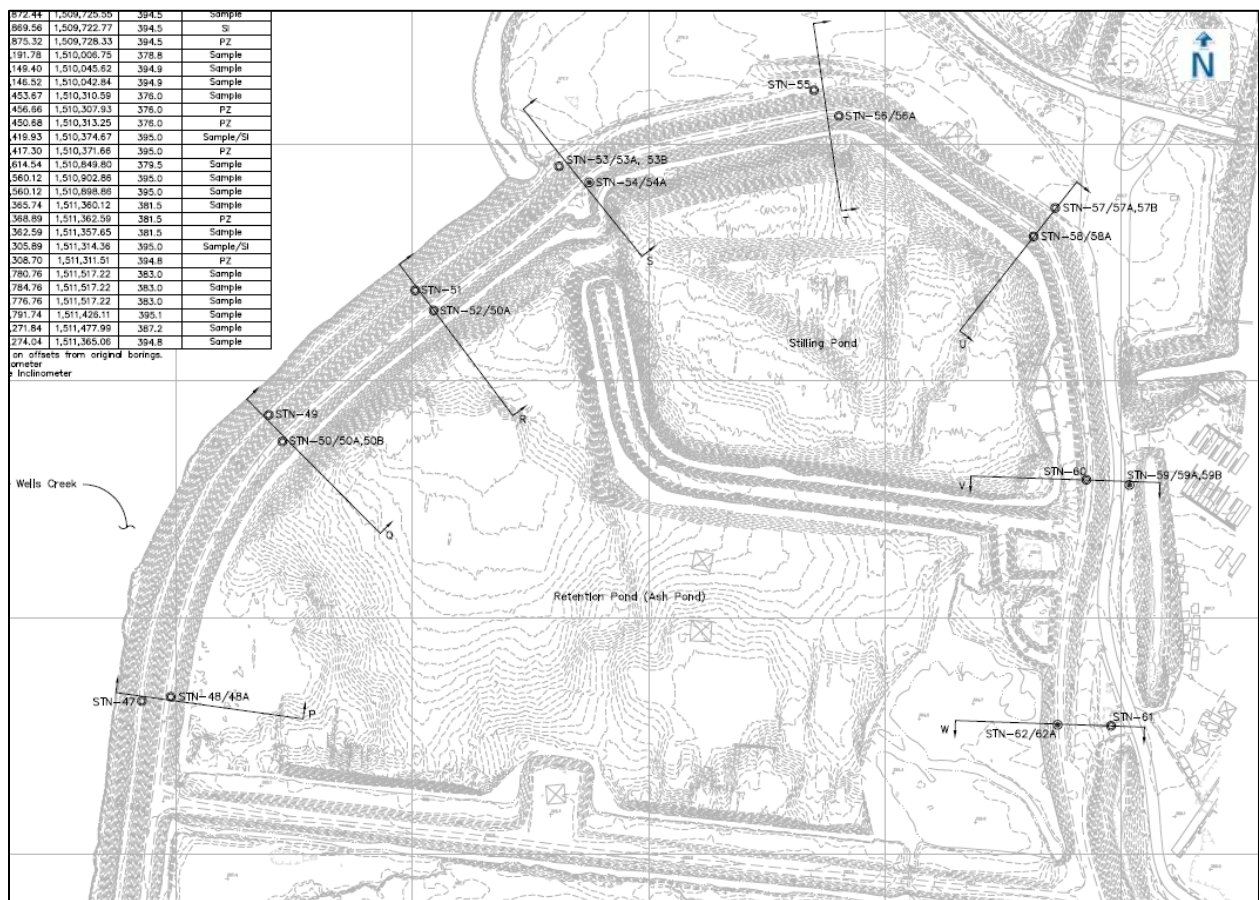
CUF Stilling Pond (including Retention Pond) – Plan View of Cross Sections
